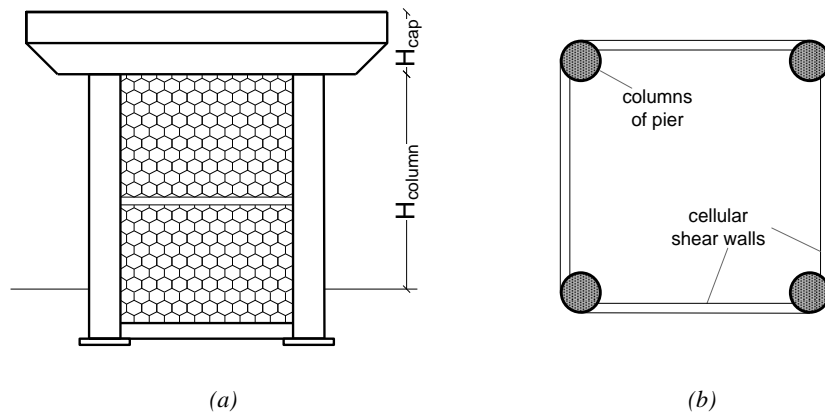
a) Cellular shear wall (honeycomb) arranged between double-column pier of a bridge, b) Plan view of a four-column pier with cellular walls applied in both directions (Keller and Bruneau [4]).
